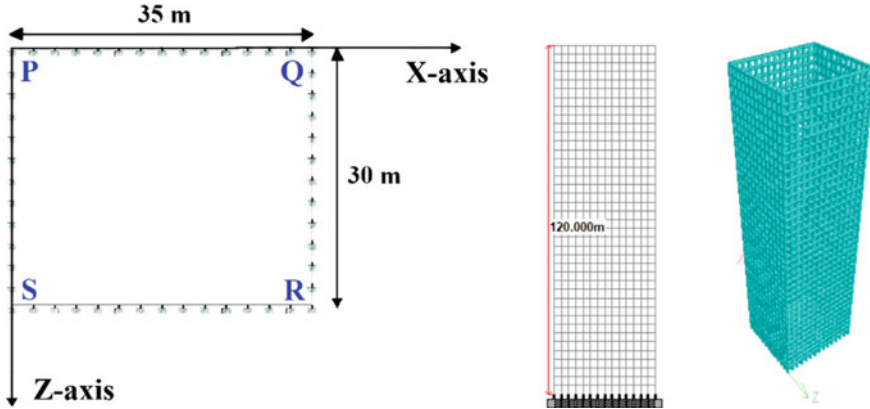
Plan, elevation, and isometric view of STAAD-pro building model
